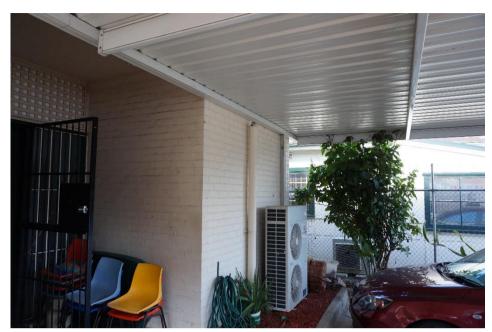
Rear extension to original house to provide space for adaptation to commercial use.
